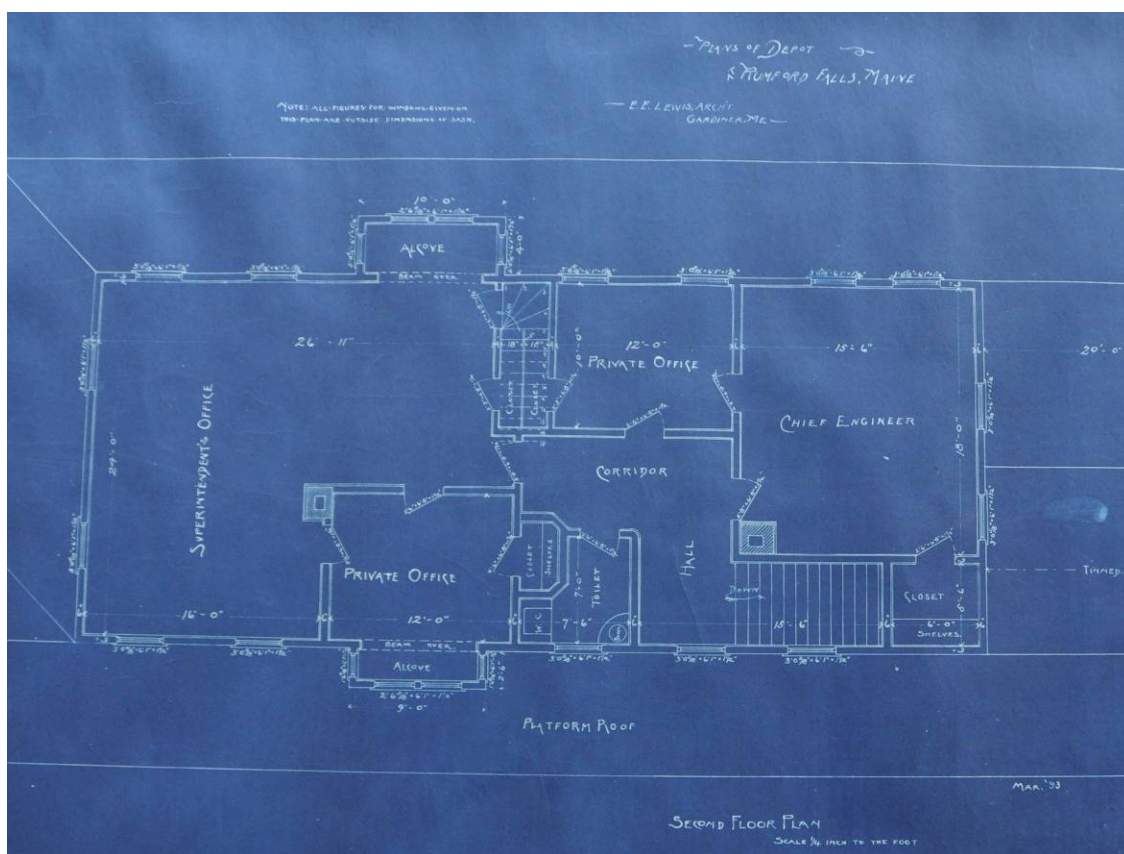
Rumford Falls Station second floor plan, April 1893. [Courtesy MHPC]
